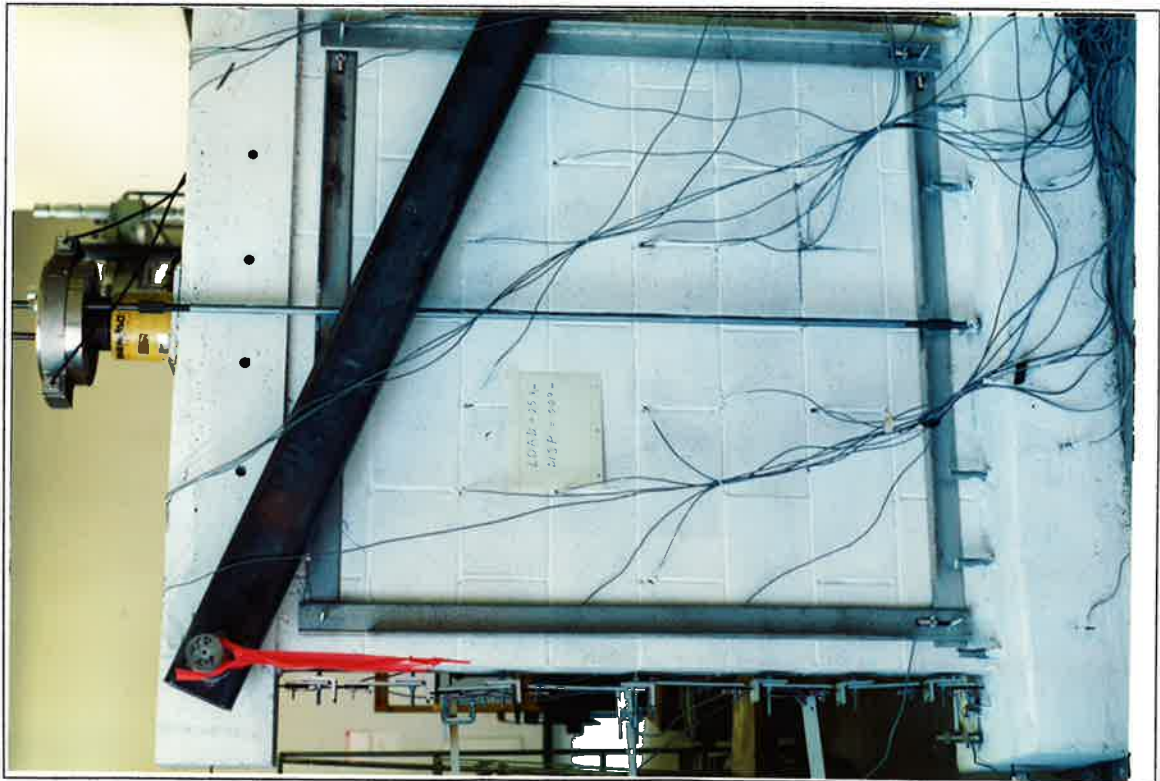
Monolithic Wall At 111 kN (25 Kips) Lateral Load
